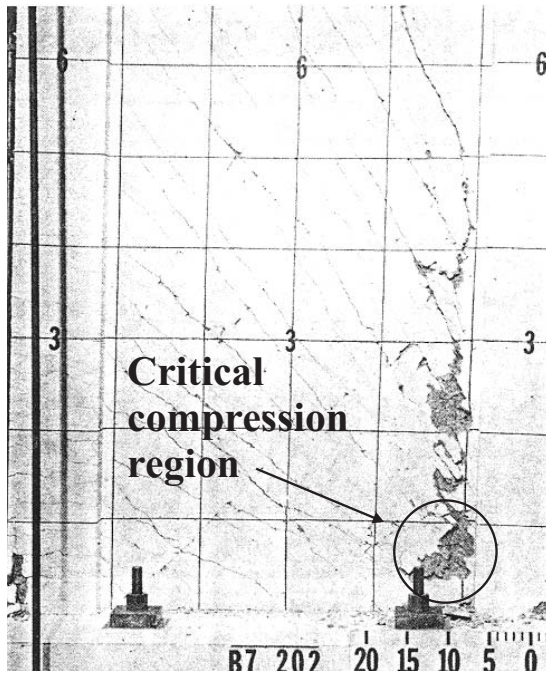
Detail of web crushing in a structural wall with confined boundary elements [7].
